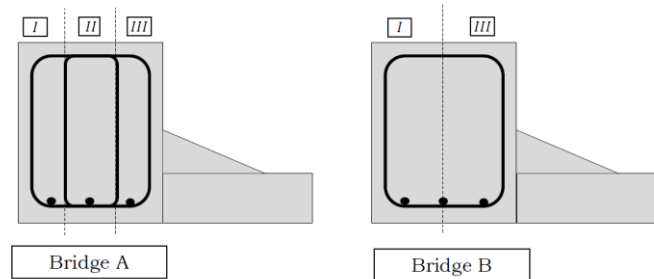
Shear reinforcement zones for bridge A (left) and bridge B (right)
